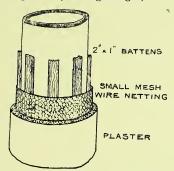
Iron Column protected with Wire Netting and Plaster.
